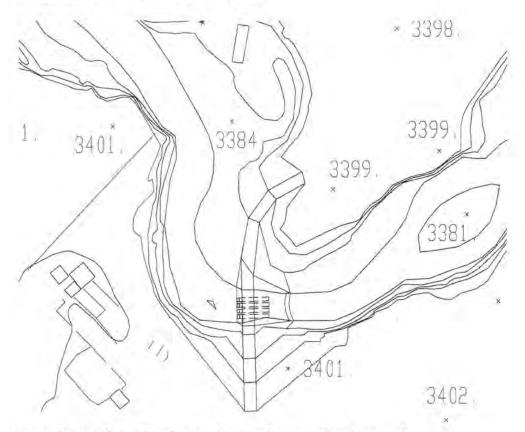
Low Water Crossing, road cut, and surrounding topography.
